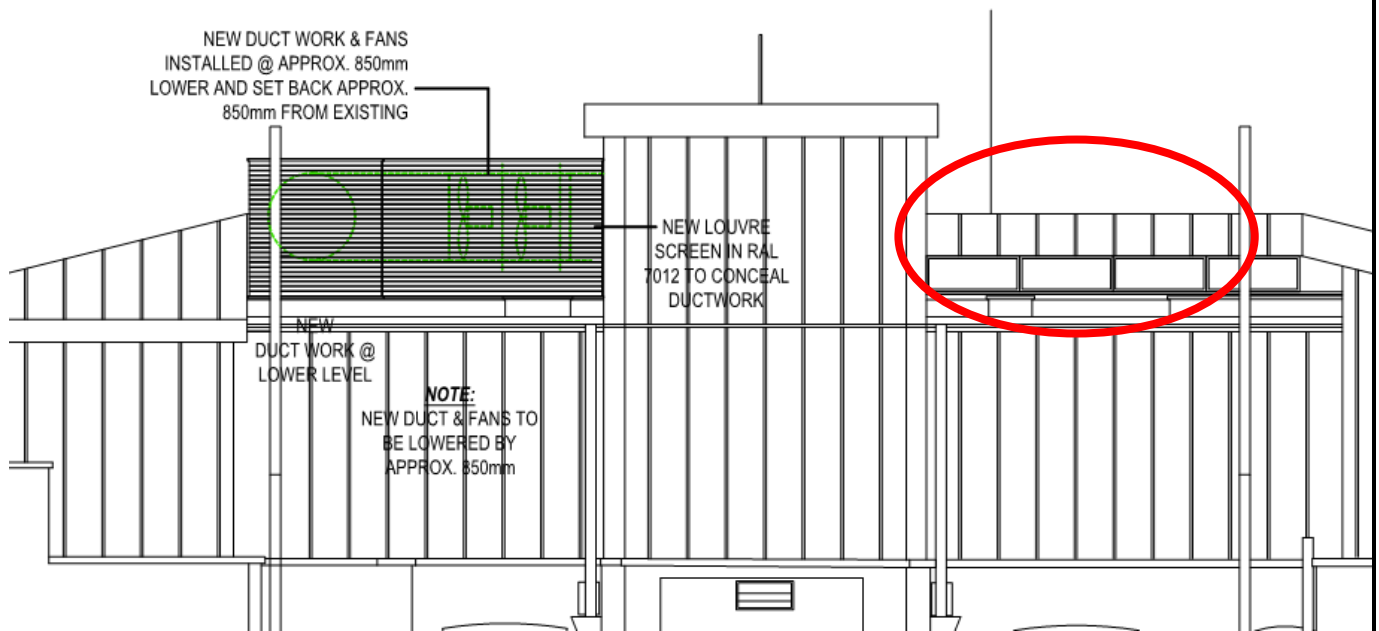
Location of proposed plant on roof in green, with current location circled in red
